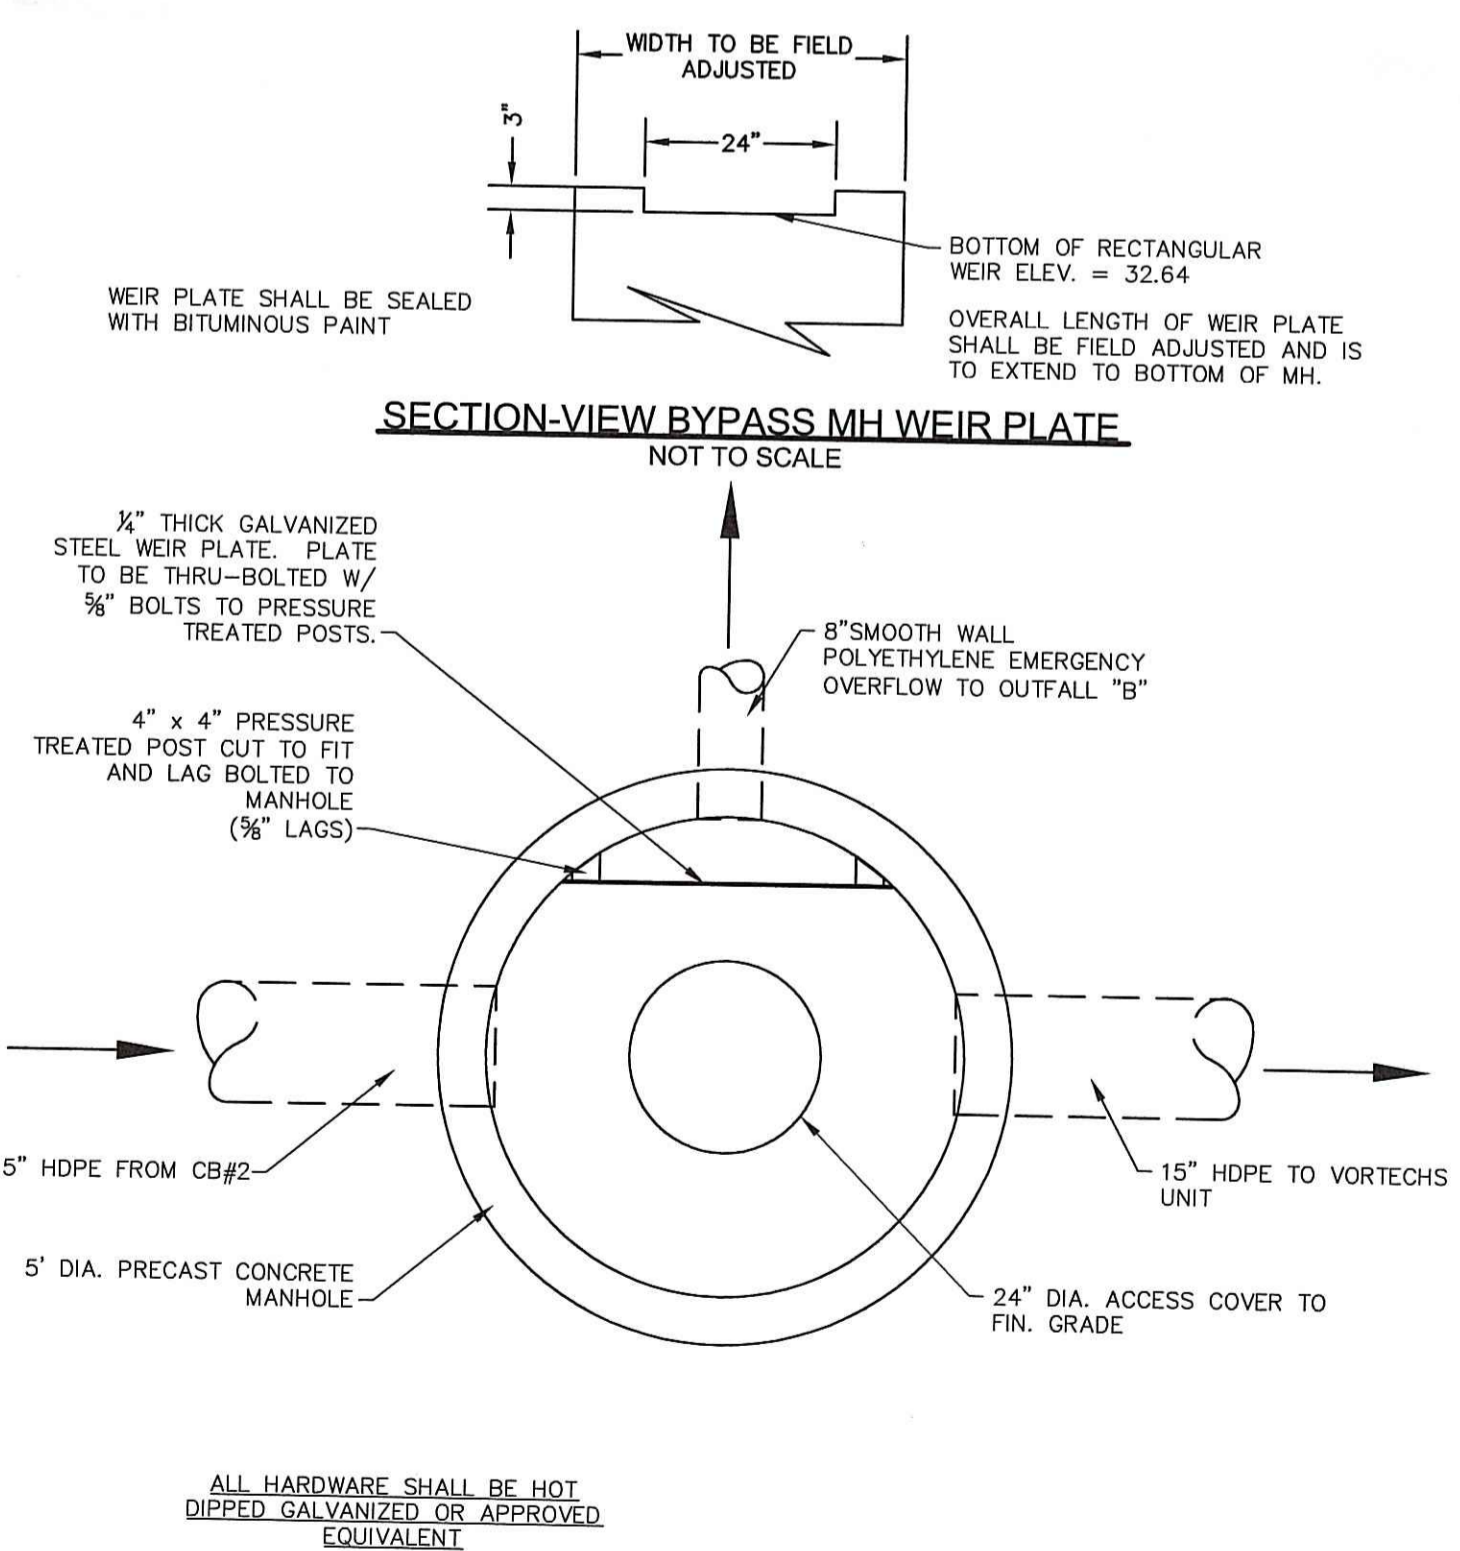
DETAIL TYPICAL DRAINAGE OVERFLOW OUTLET
